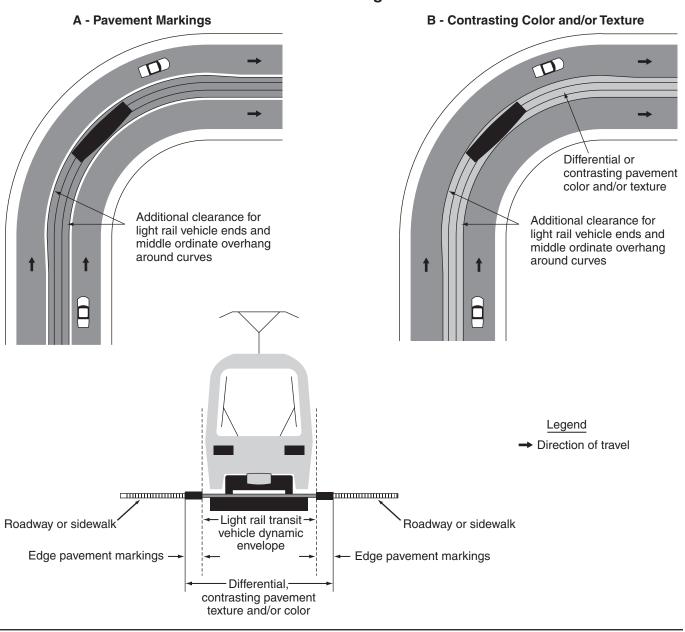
B-8. Example of Dynamic Envelope Pavement Markings at Grade Crossings
